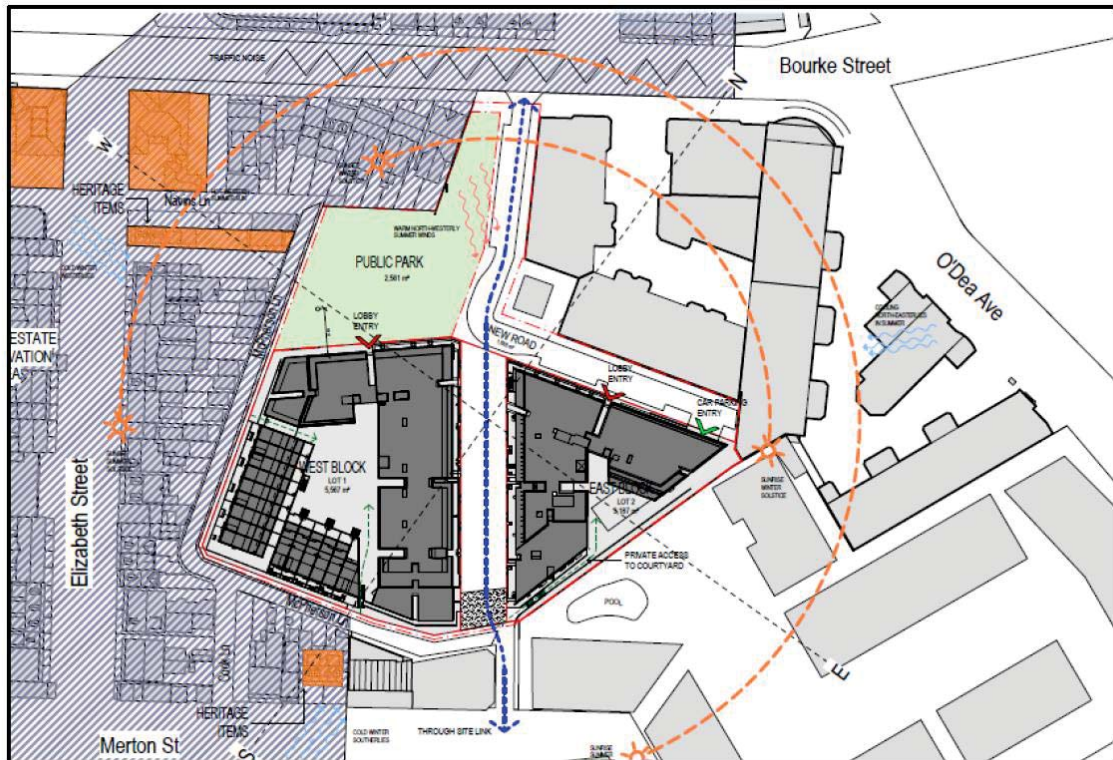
Site plan after proposed development. (Source: JQZ. Seven Pty Ltd)
